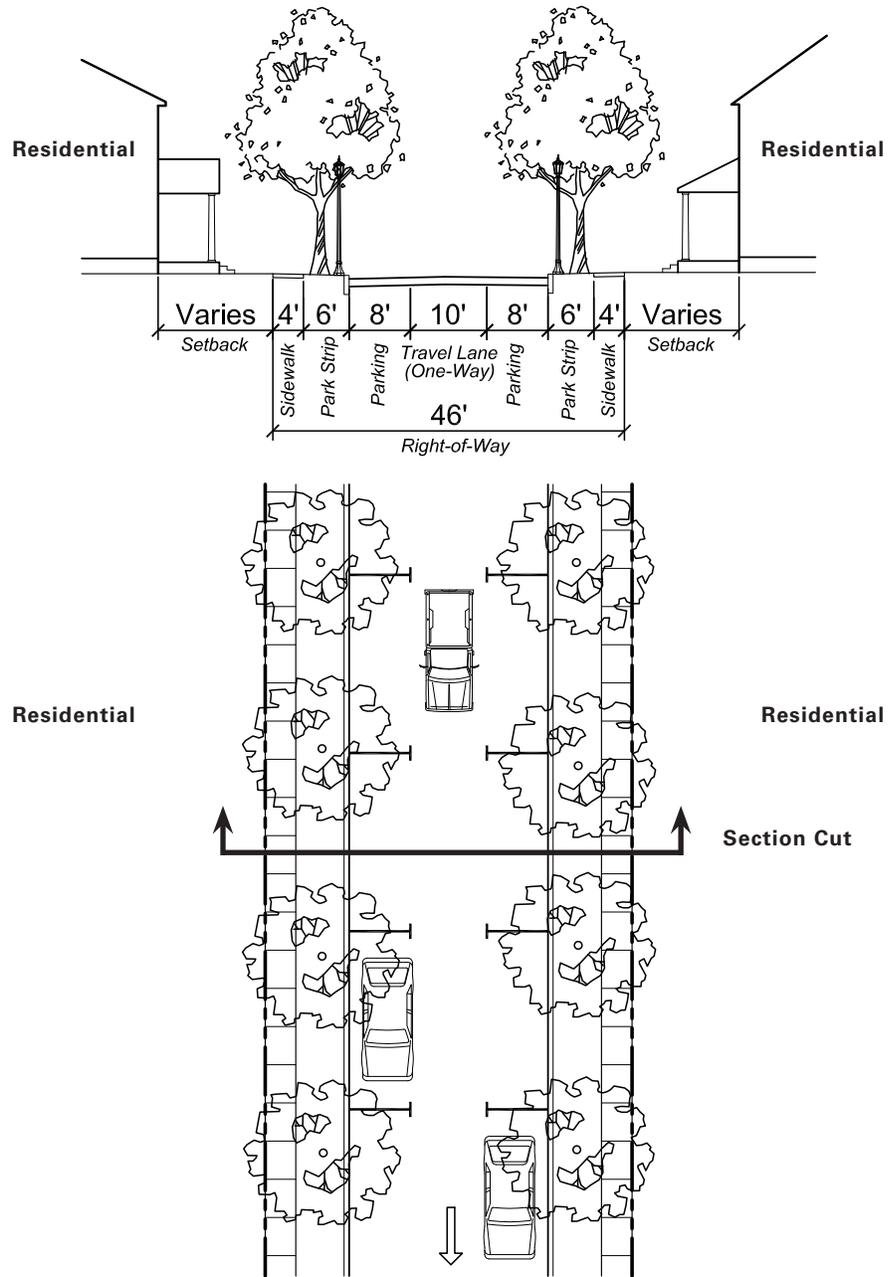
Proposed Section and Plan: One-Way Street Parking Both Sides
